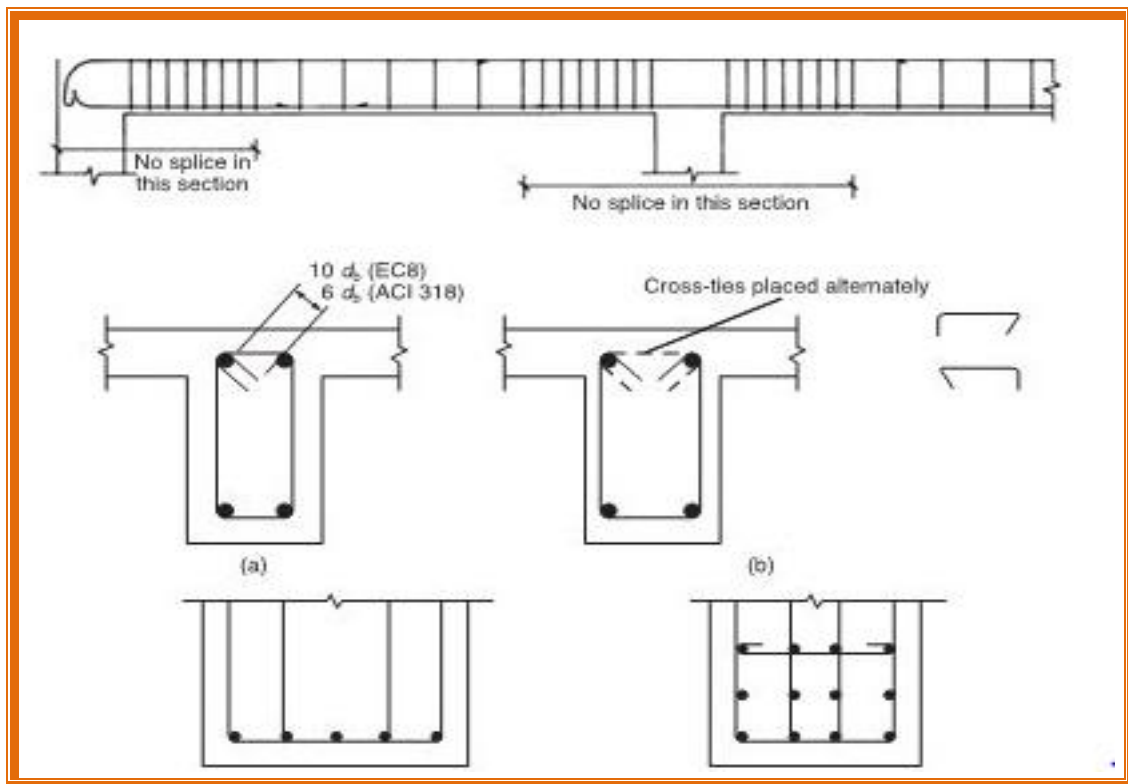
the detailing of ductile beam reinforcement(Booth and Key, 2006)
